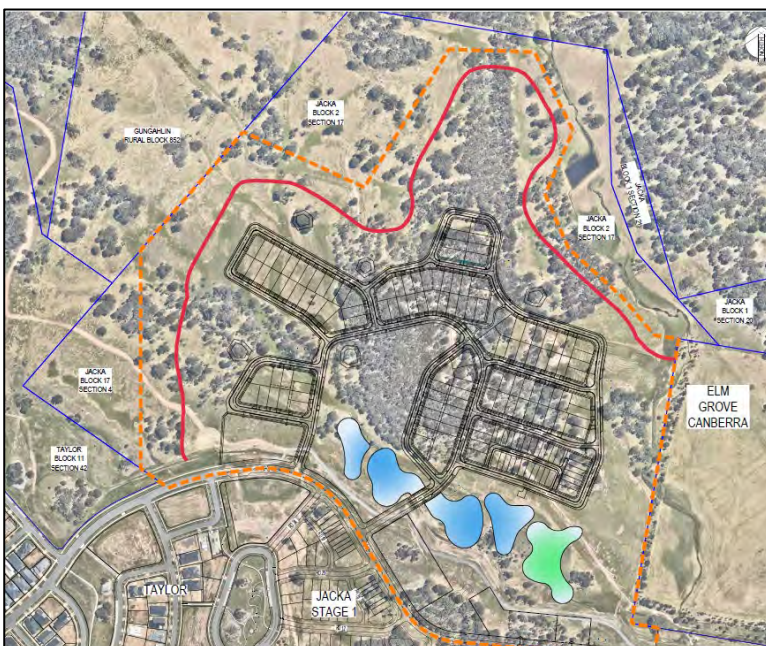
Jacka 2, Stage 2 – Approved Concept Master Plan
